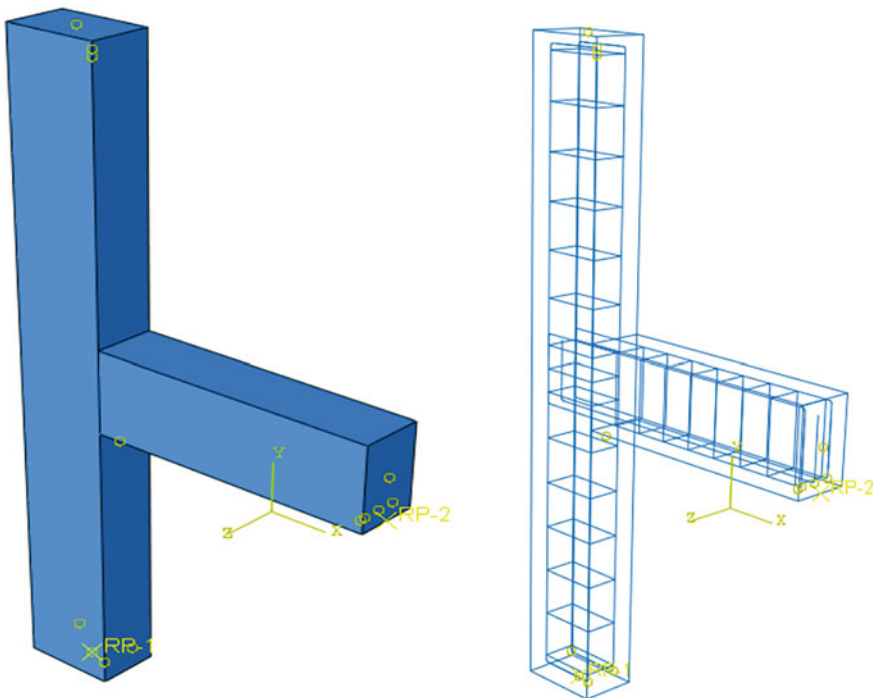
Finite element model of beam column joint developed in ABAQUS
